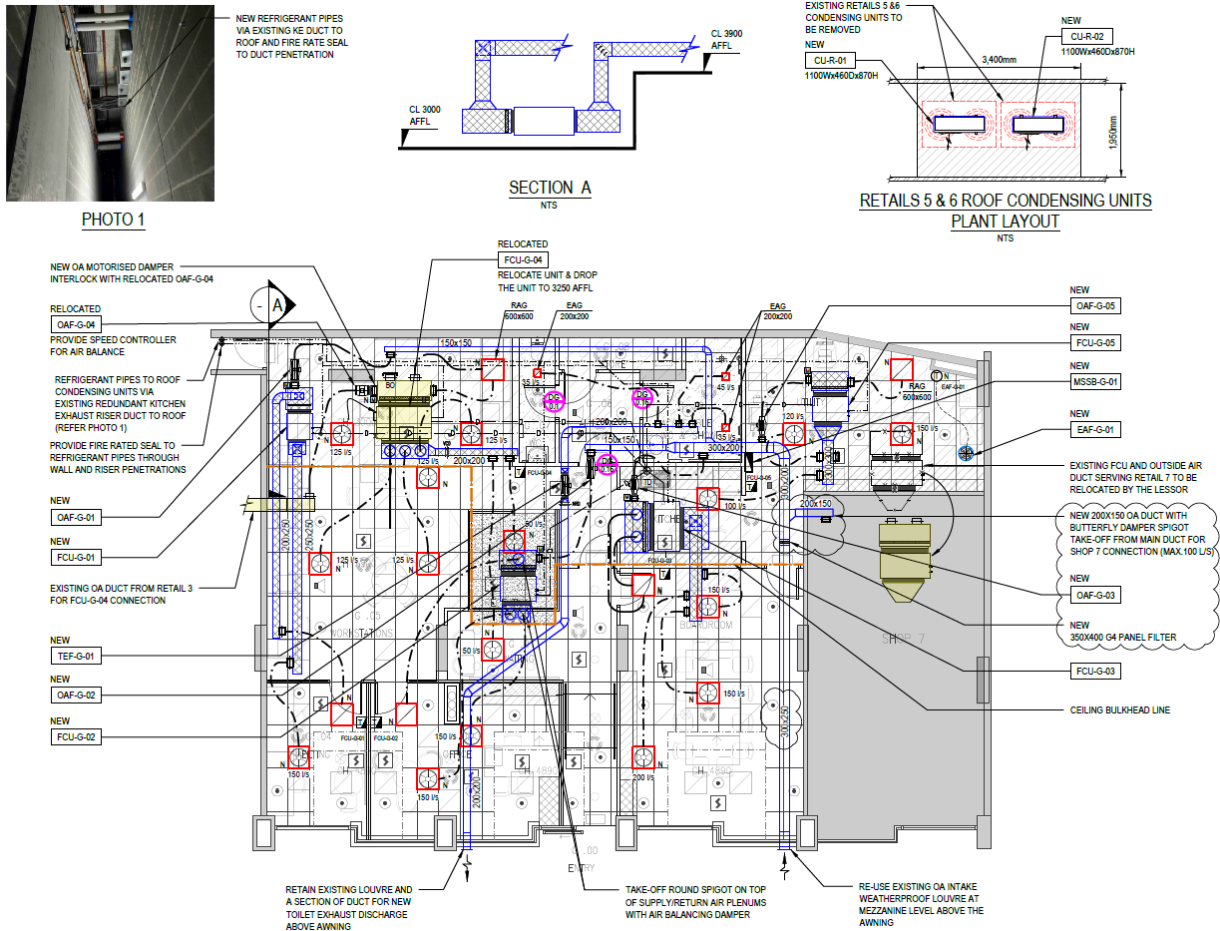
Mechanical Services Plan – Mechanical Layout (Source: VOS Group 2023)
